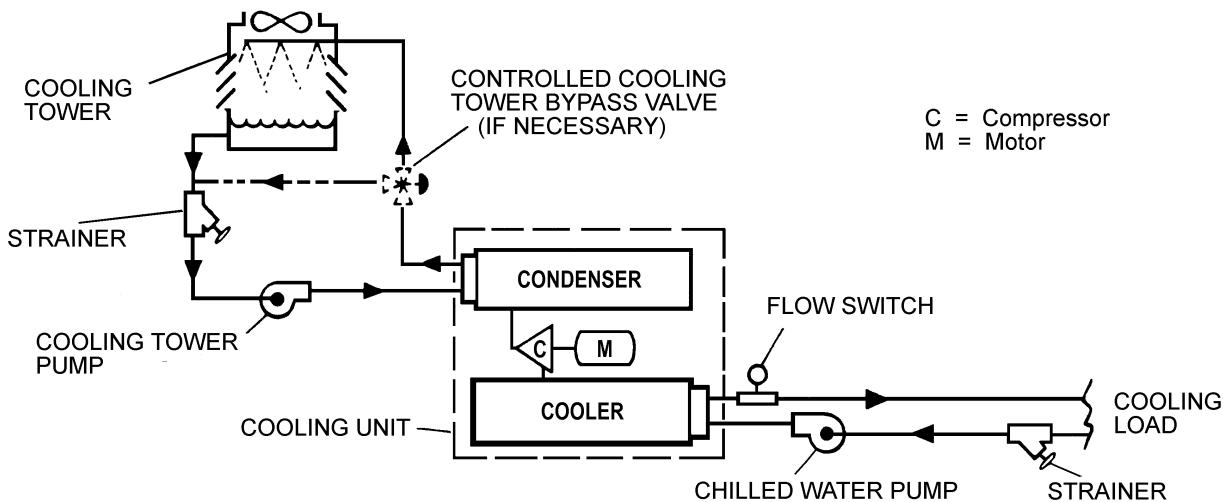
SCHEMATIC OF A TYPICAL PIPING ARRANGEMENT FOR COOLING UNITS
